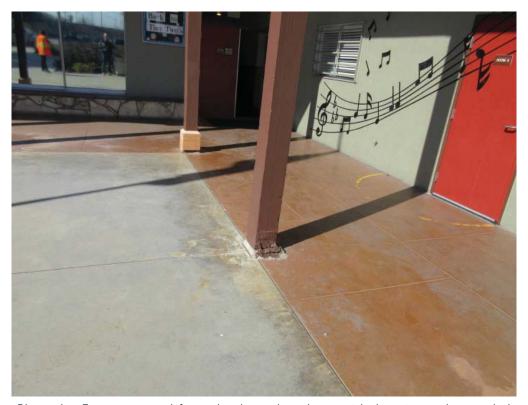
Entrance wood framed colonnade column with deteriorated corroded base connection.
